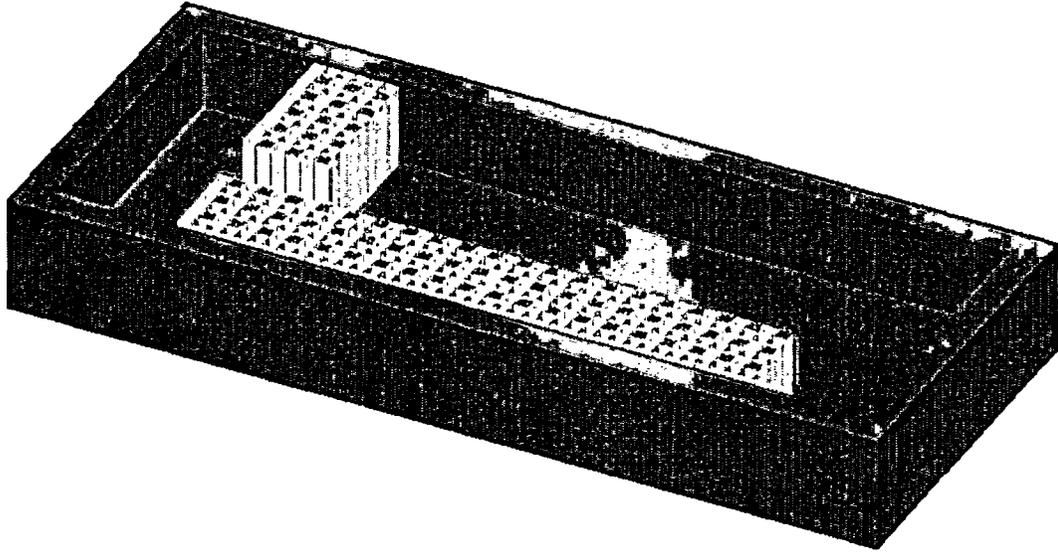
Layout of the New Fuel Inspection Pit
